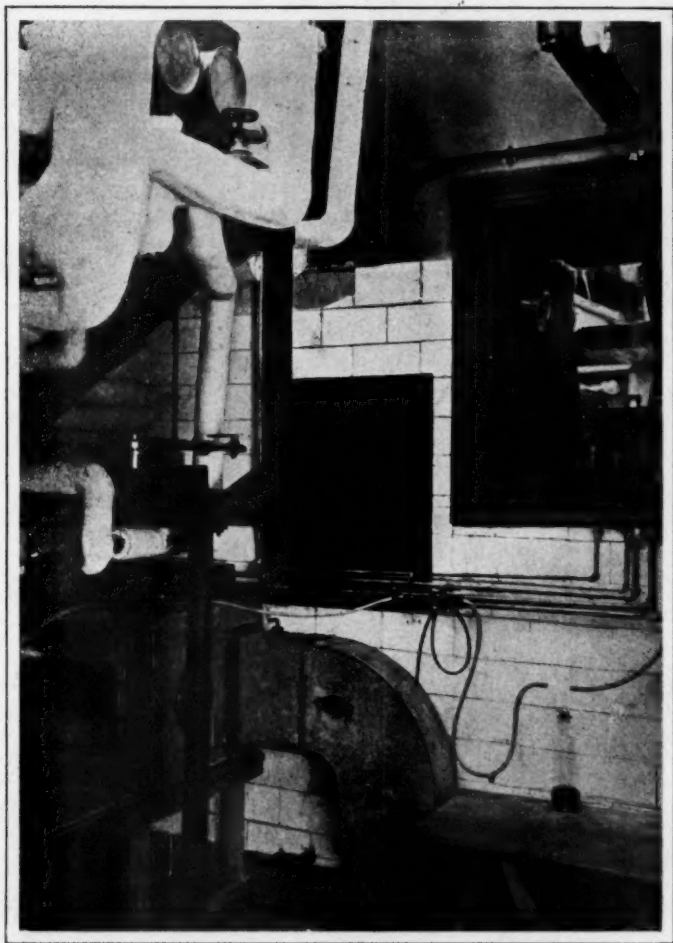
View of Apparatus Room, Looking Toward South Wall.
